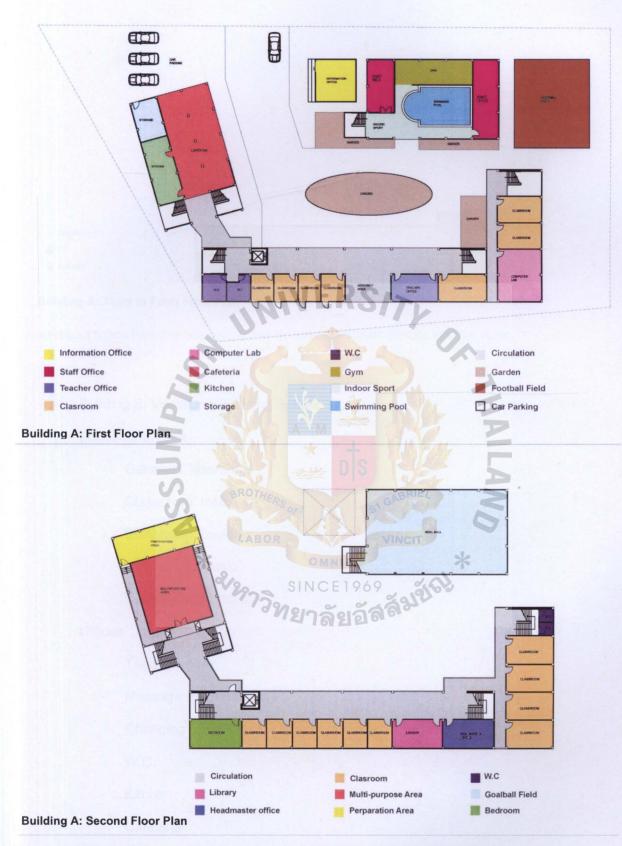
FLOOR PLANS OF BUILDING A: PATTAYA REDEMPTORIST SCHOOL FOR THE BLIND
